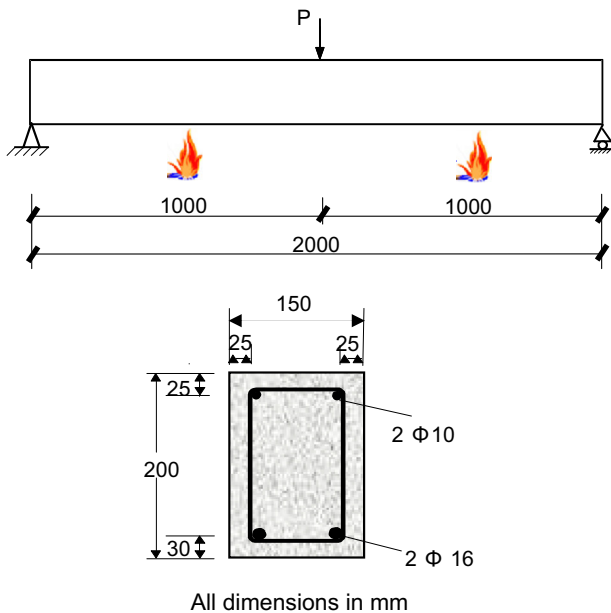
Details of a simply supported reinforced concrete beam under ISO834 fire.
